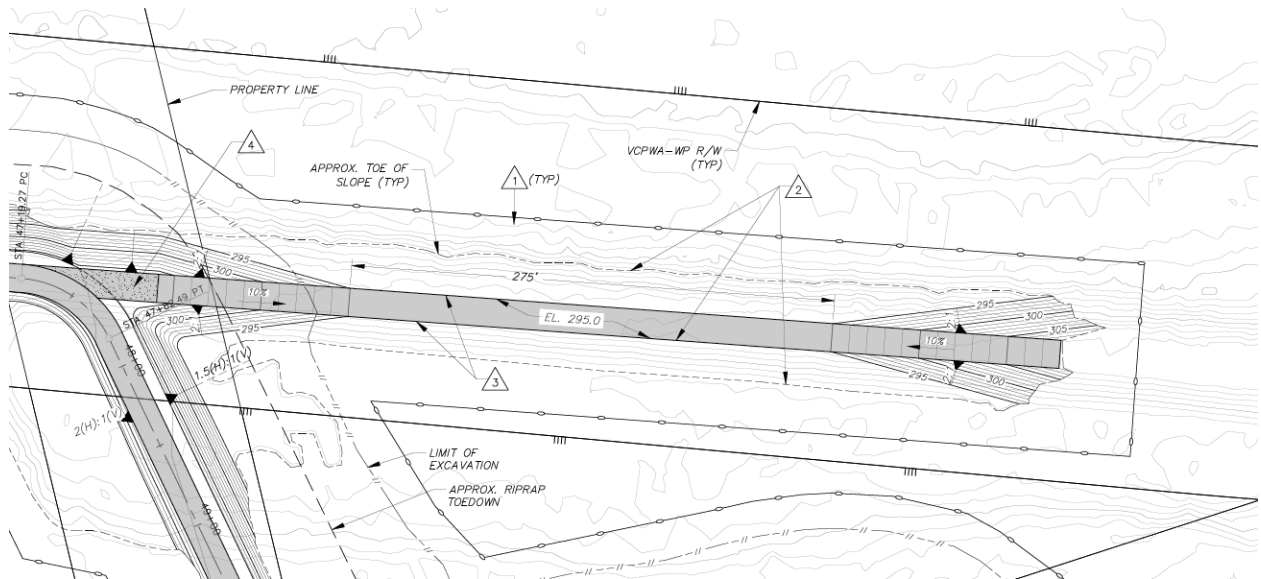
Plan View of Levee Lowering / Dip Crossing
